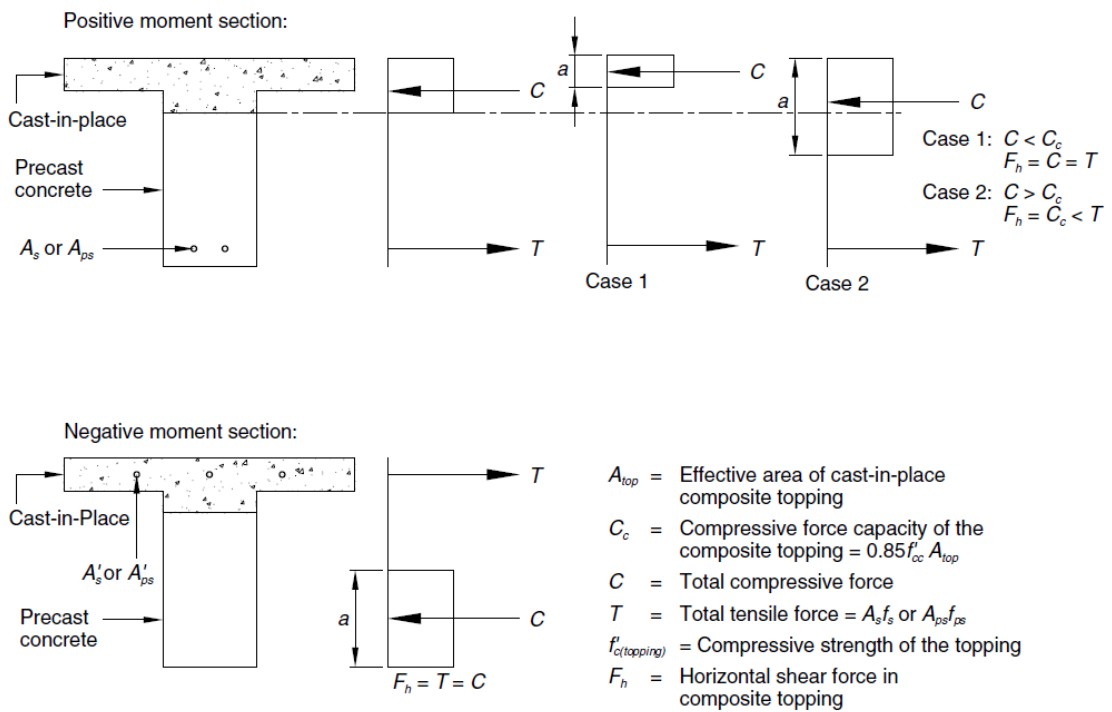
Typical horizontal shear in composite concrete beam, PCI Design Handbook 2010.
